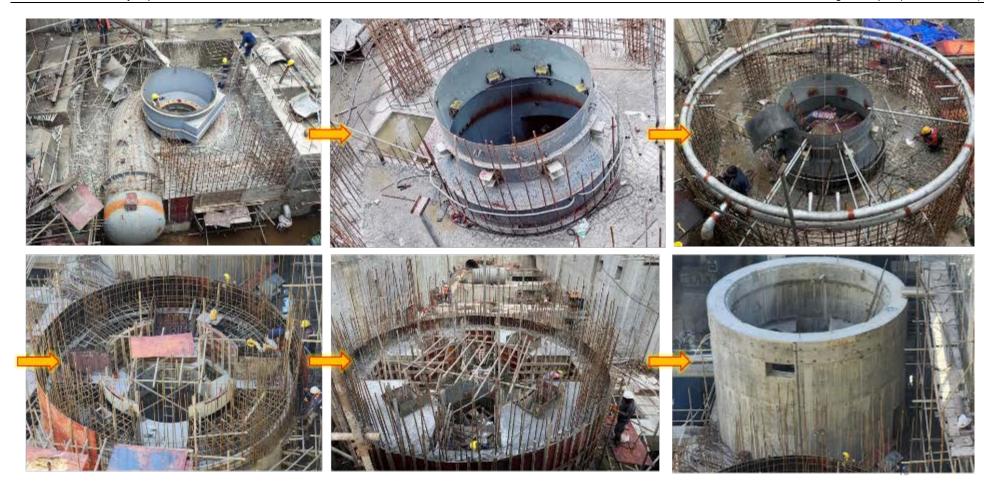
Progress of interface concrete works (Spiral case installation, pit liner installation, ventilation and heat exchange pipes and generator casing)
